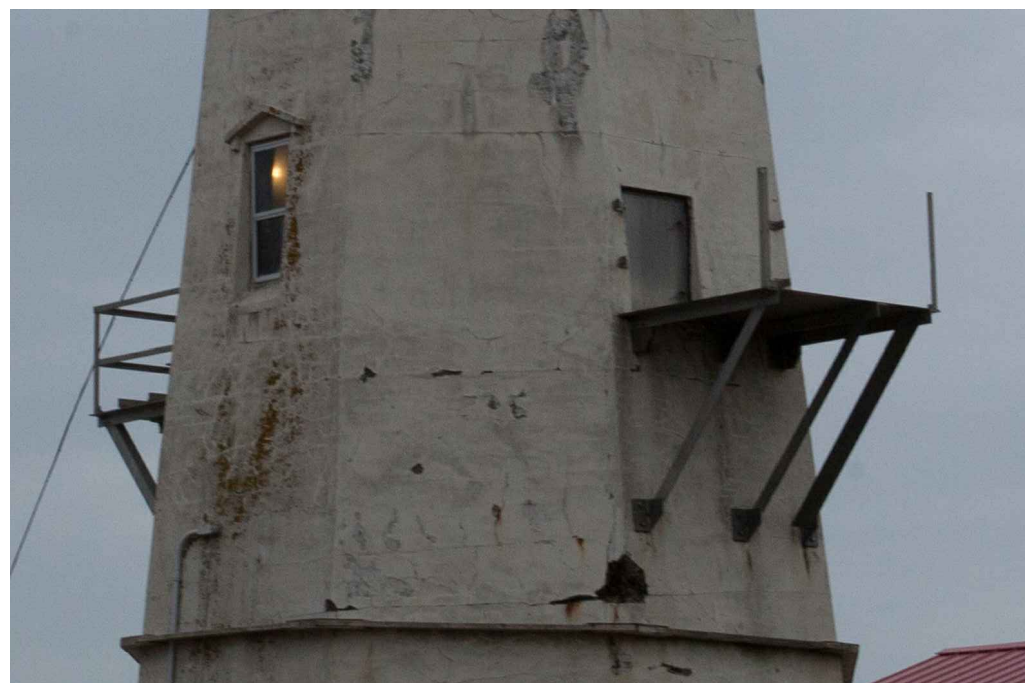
EXISTING PLATFORMS TO BE REMOVED. EXISTING PLATFORM ACCESS DOORS TO BE REMOVED. REINSTATE CONCRETE TO MATCH EXISTING BOARD FORM FINISH. REFER TO STRUCTURAL.
